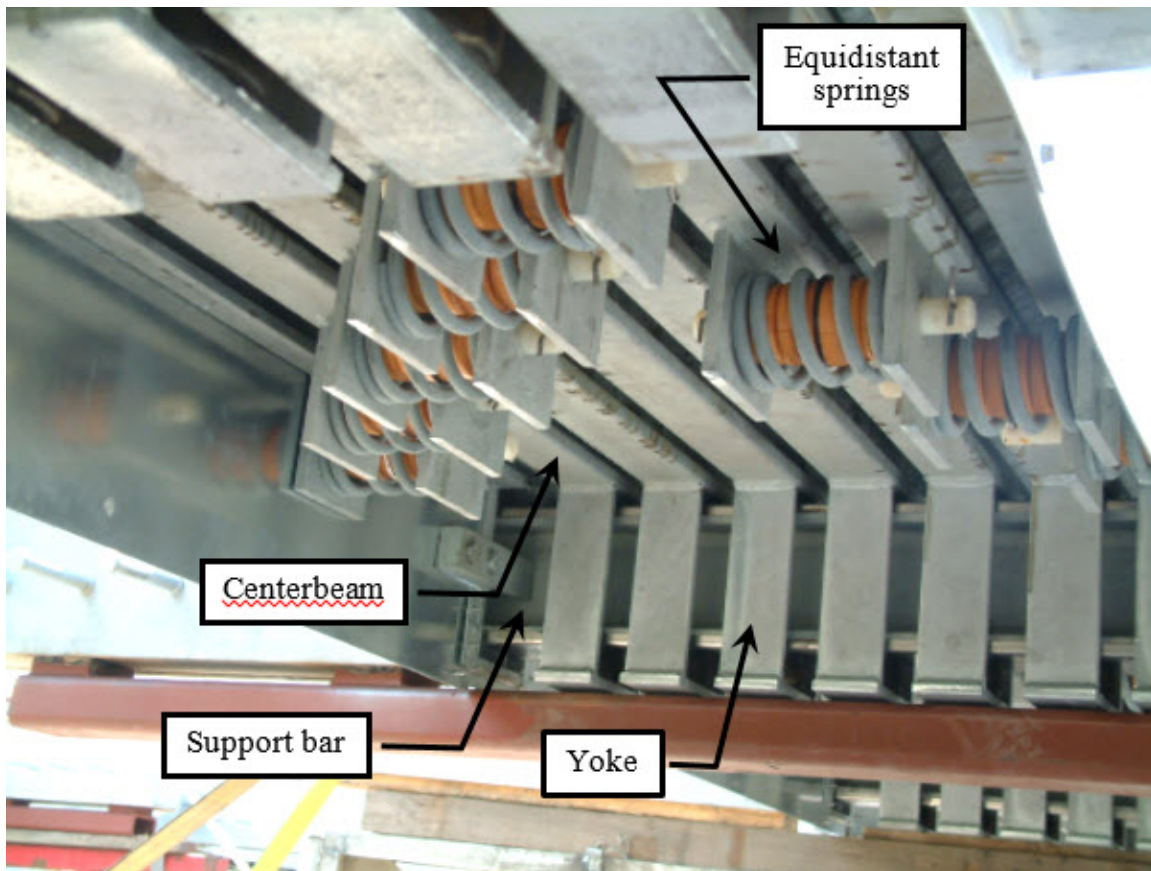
Underside of modular joint with details shown.
